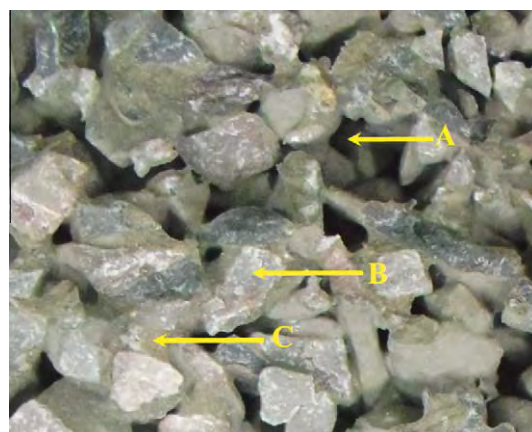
Fracture surface of PGC containing NA; (A) void; (B) failure at bond; and (C) geopolymer paste.
